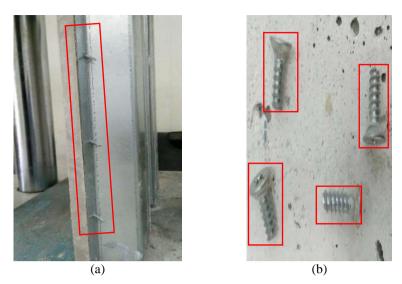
Shear connectors failure: (a) shear connector slightly titled from the origin; (b) shear connector fractured after the test
